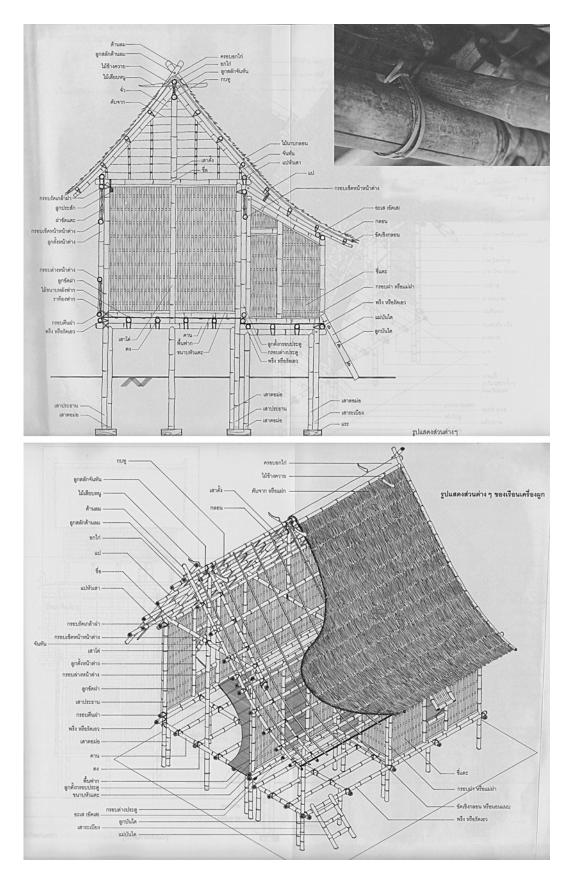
From top to bottom; the binding detail, the end elevation, and the isometric view of thatched Thai house called 'Ruen Krueng Pook' (Nilladaj 2004, p.43, 45 & 58)
